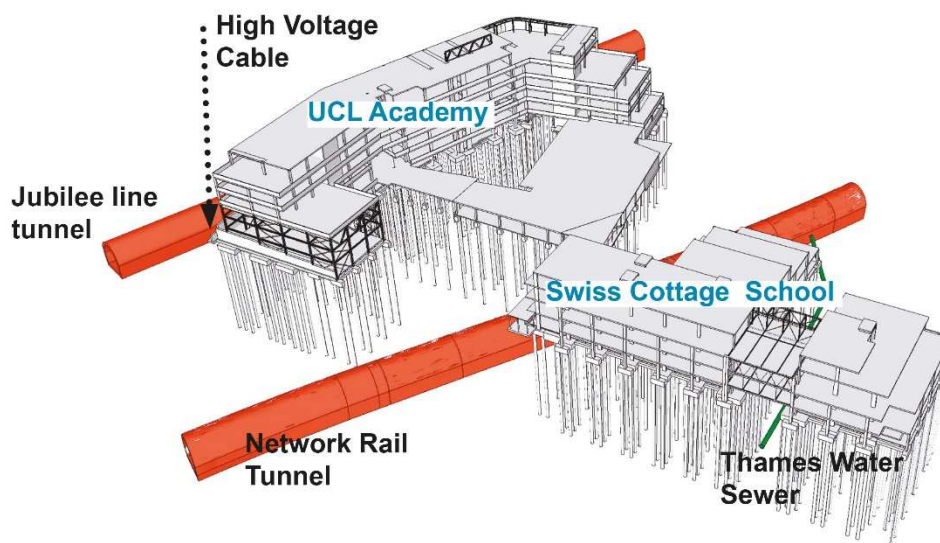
Adelaide Road Schools. Whole Site Strategy – Structural Model Indicating Site Restrictions. (© Penoyre&Prasad)
